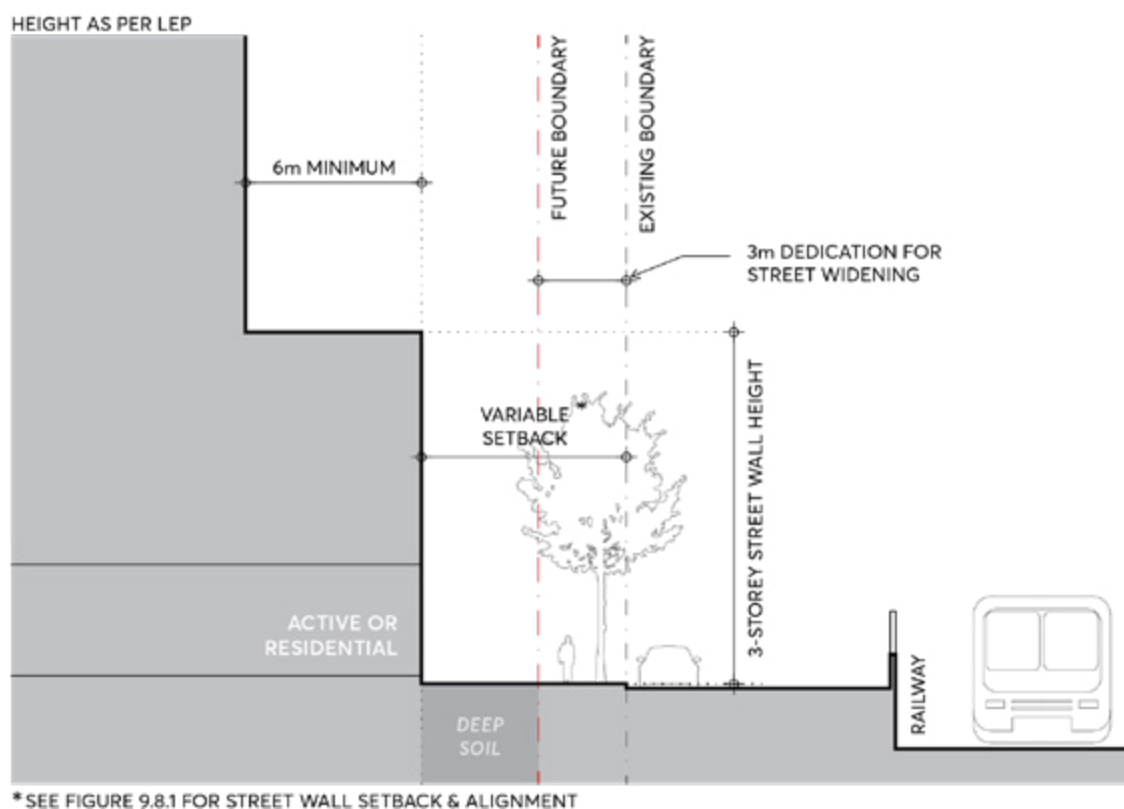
Station Street West (Section A) Setbacks and Street Wall Height
